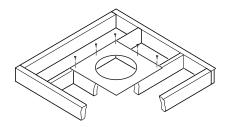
Firestop Spacer with Attic Space Above Ceiling
